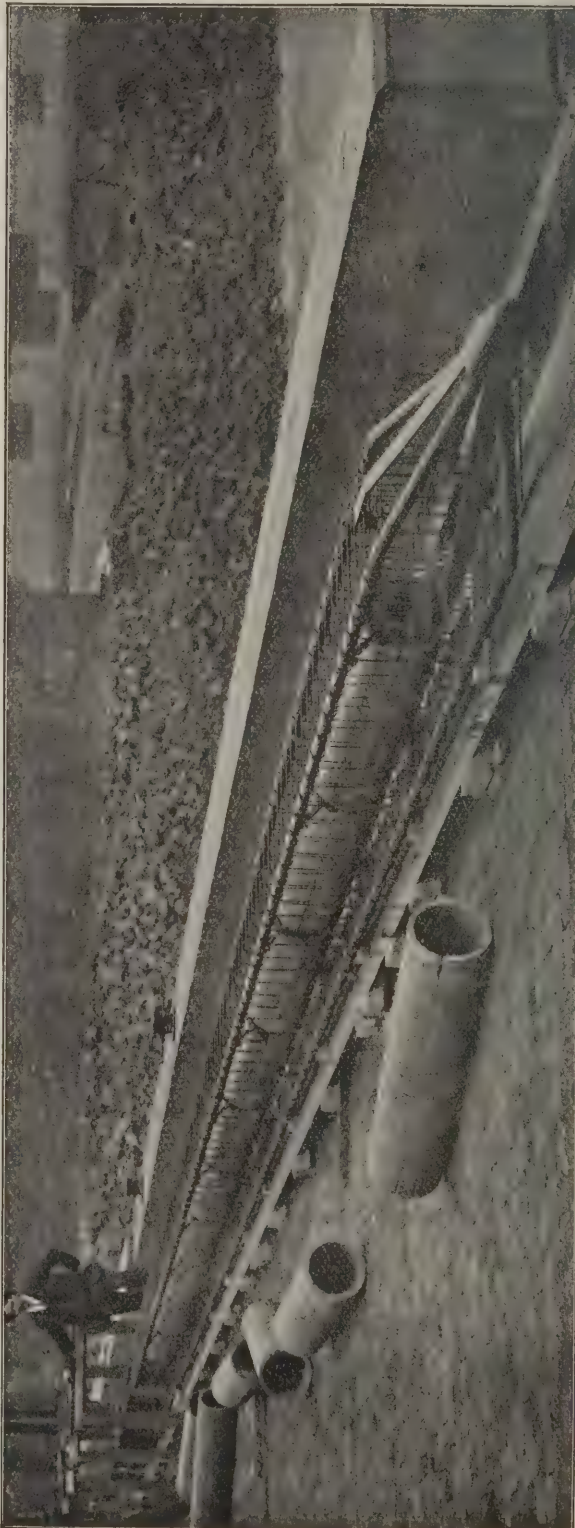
HOLLOW DIAPHRAGM PILES.
